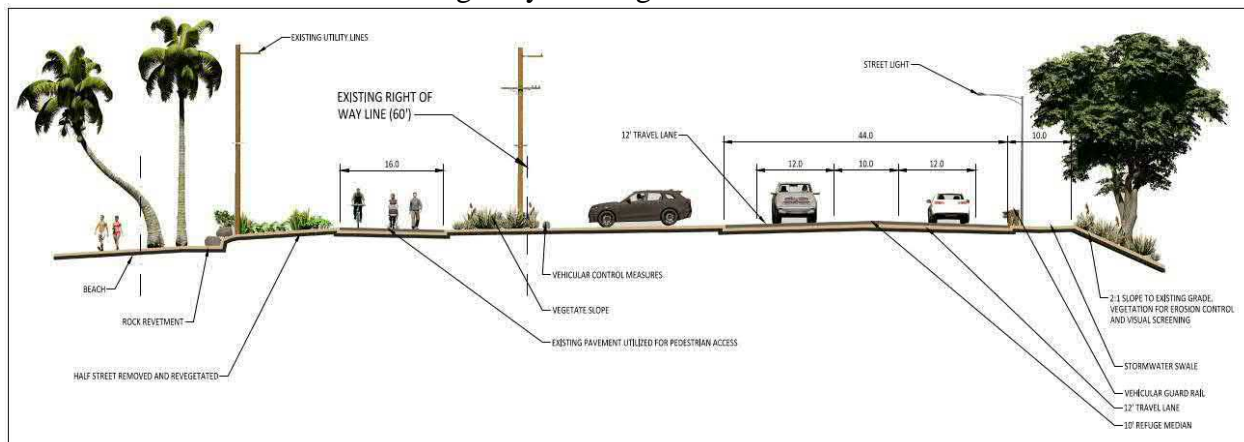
"Pedestrian Shift" Alternative Alignment Section
